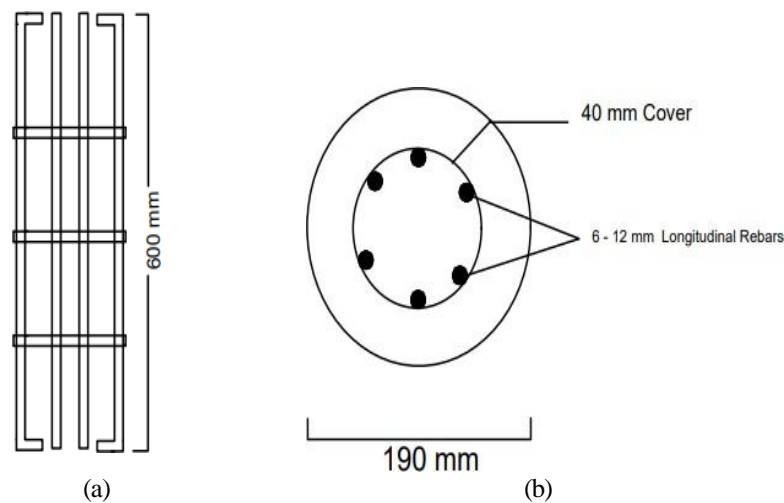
(a) Reinforcement Detailing RC Circular Column Longitudinal, (b) Cross Section.
